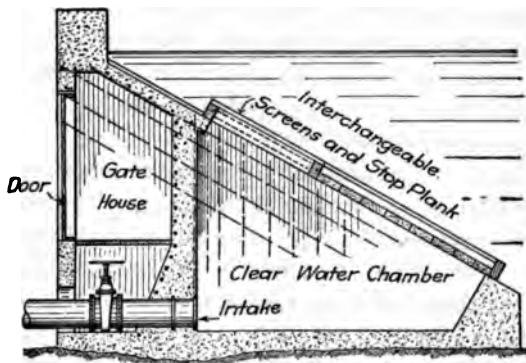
Intake and Gate House for Dam at Walton, N. H.
